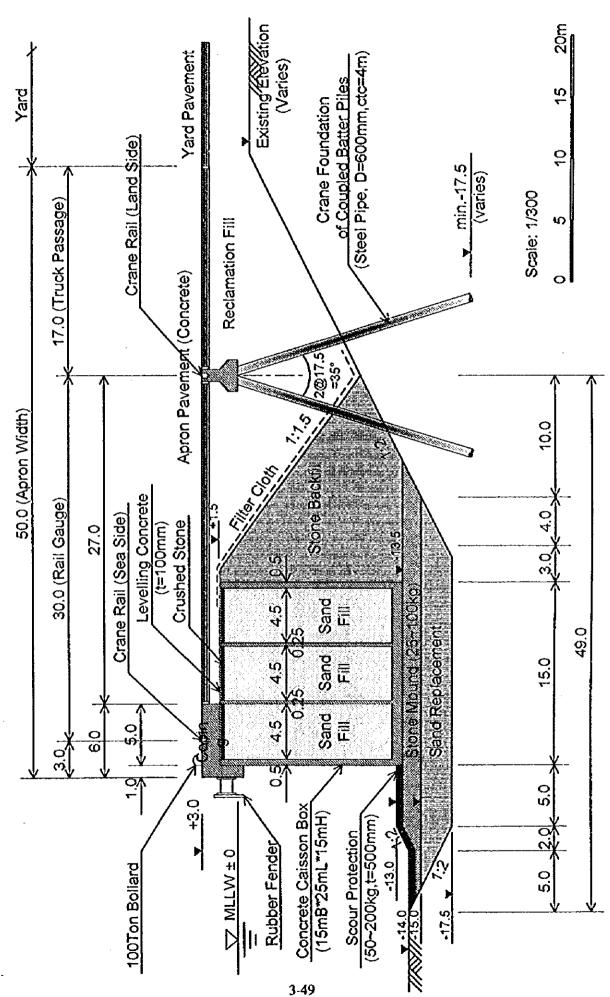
Typical Section of the Caisson Quay Wall for the New Container Terminal at Cubi Pt.
